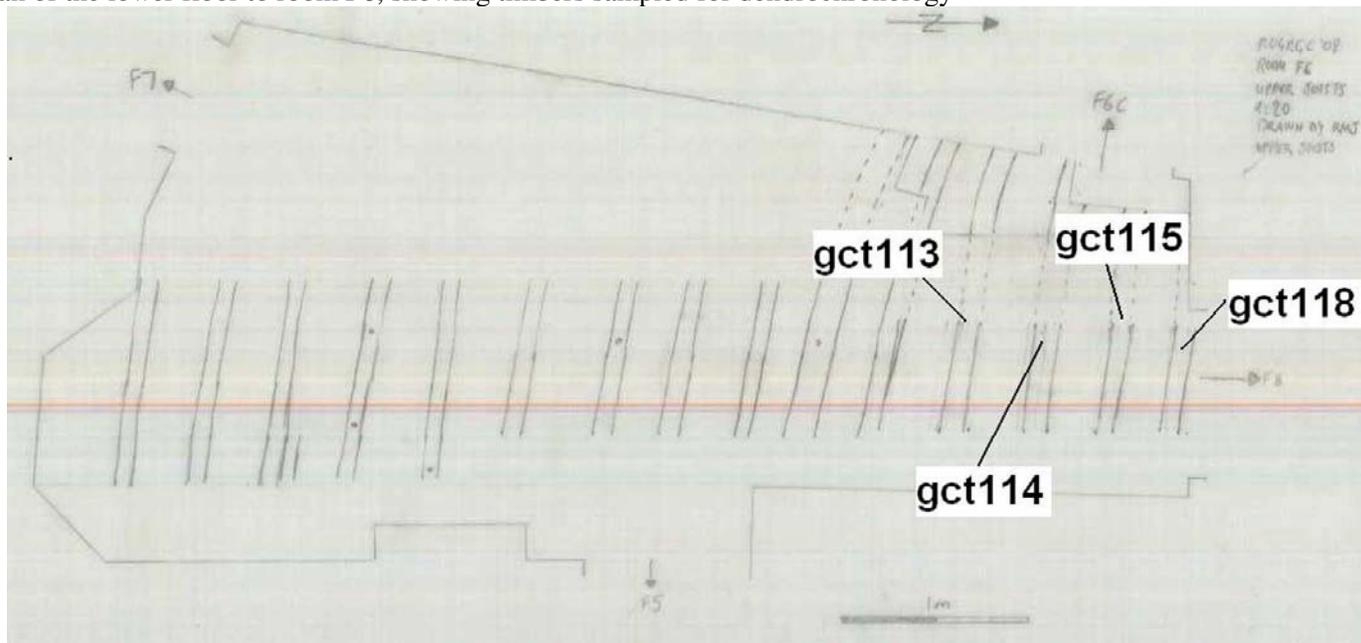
Floorplan of the upper floor level to room F6, showing timbers sampled for dendrochronology
